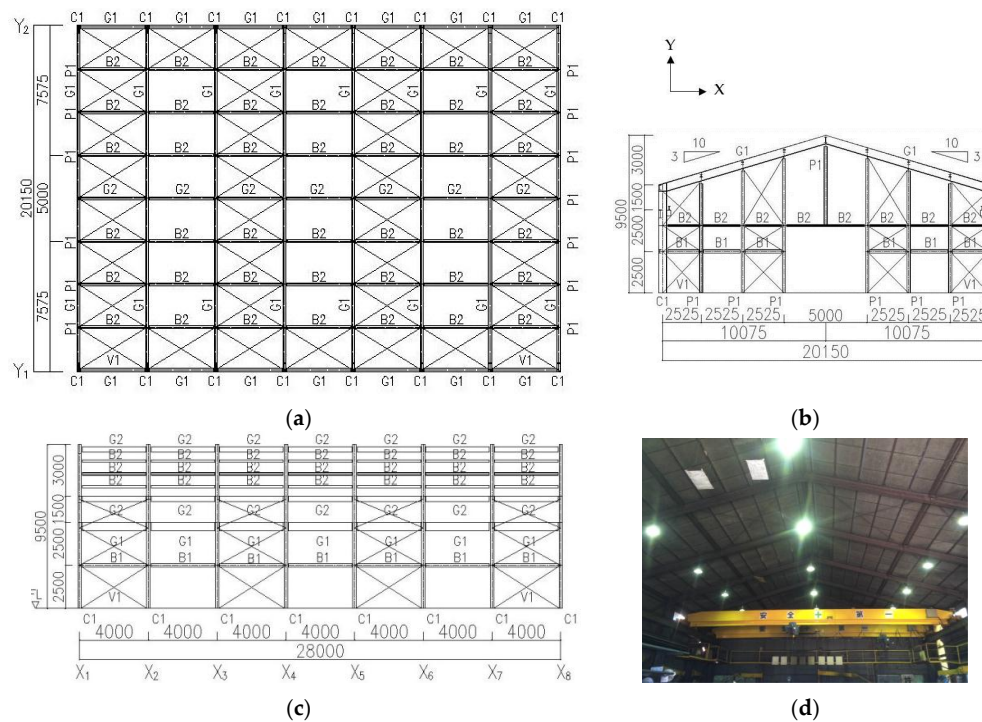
(a) Plan; (b) elevation (x-axis); (c) elevation (y-axis); (d) interior view. Unit: mm.
